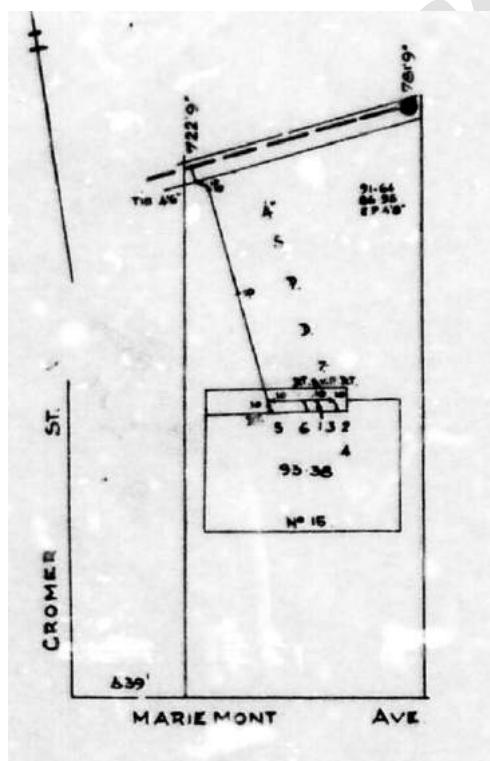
Property plan showing the footprint of the house, 1960 (Source: Property Sewerage Plan, MMBW)
